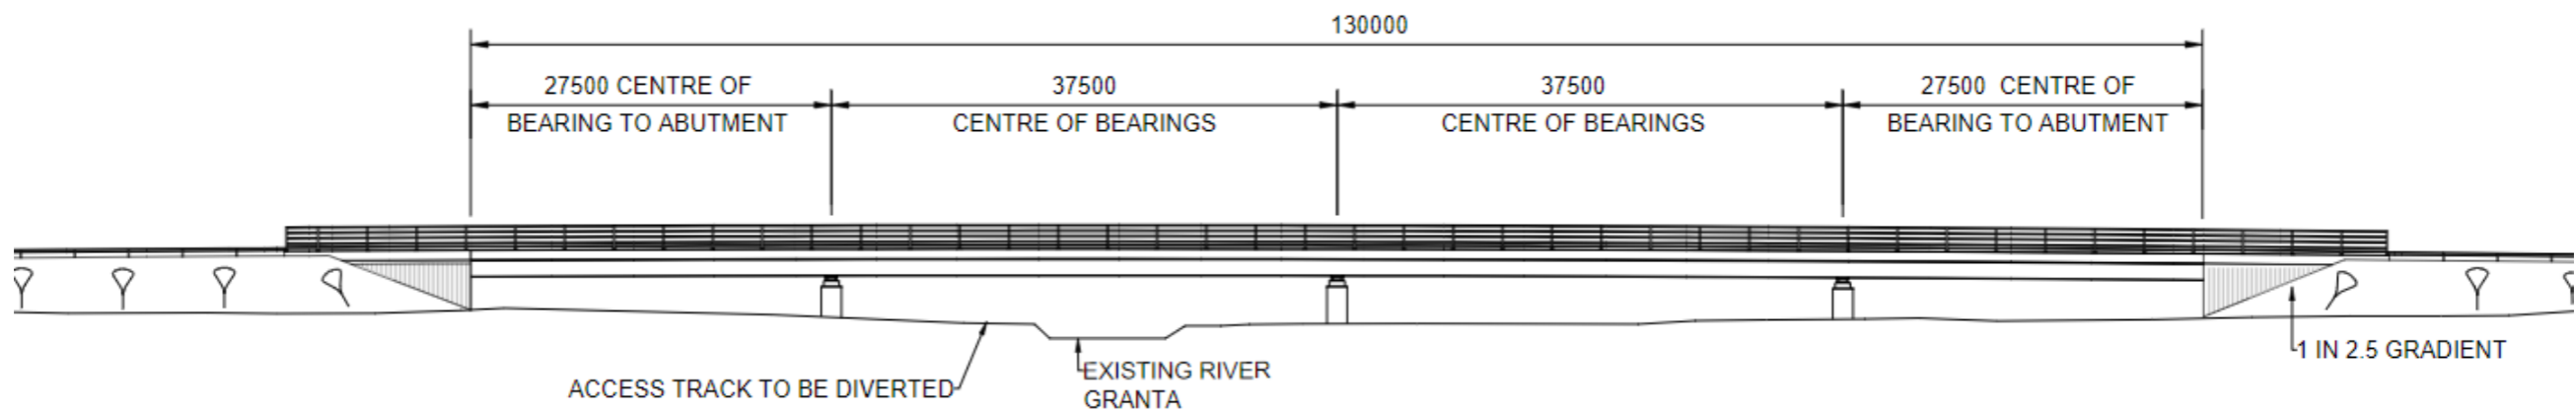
Elevation of the proposed River Granta (Babraham) crossing Viaduct. Numbers are in mm.
